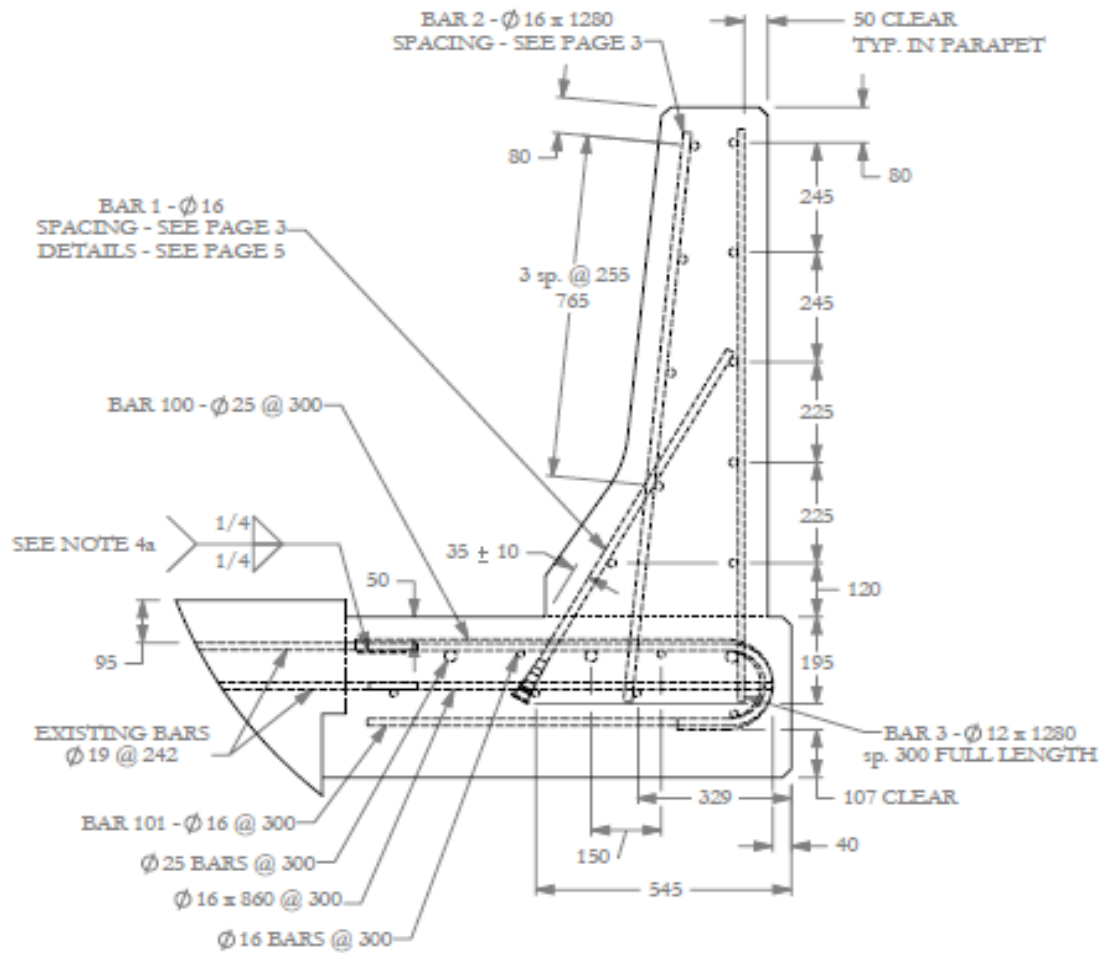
Schematic diagram of the Reinforcement for the constructed barrier wall
